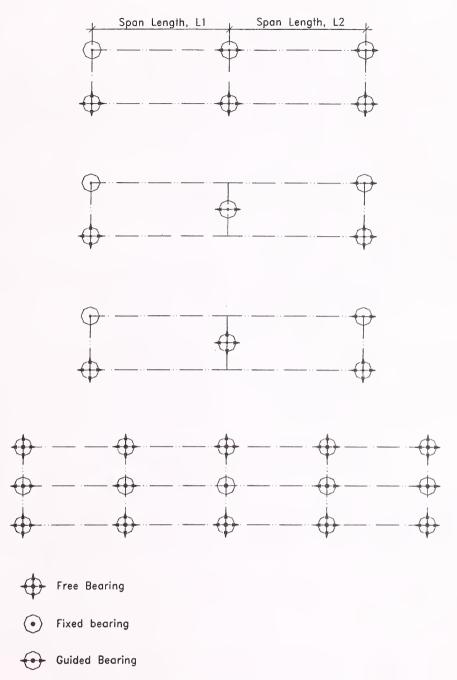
Typical Bearing Layouts for Straight Continuous Bridges
